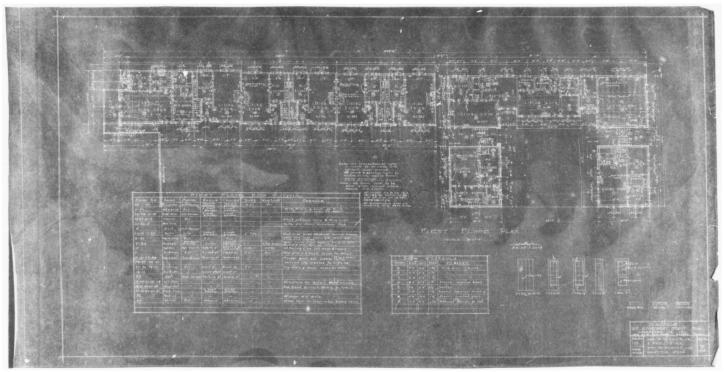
Beauville, First Floor Plan – 1928 (2 of 7)
